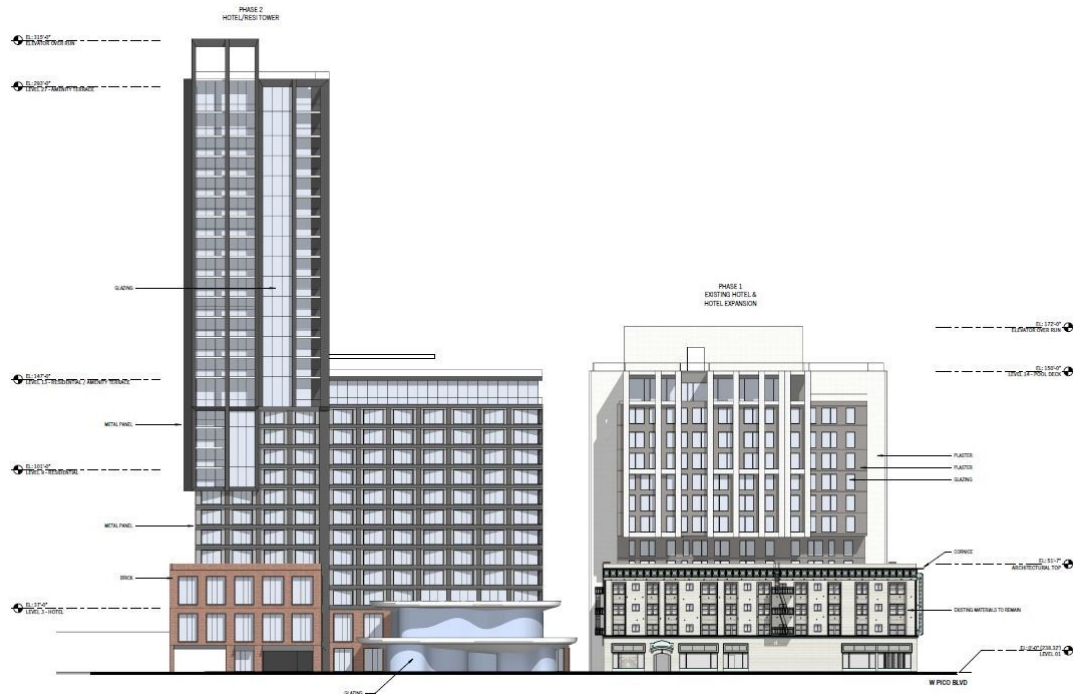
Rendering showing the west elevations of the Existing Morrison Hotel and Hotel and Residential Tower excerpted from the entitlement submittal in Appendix E.
